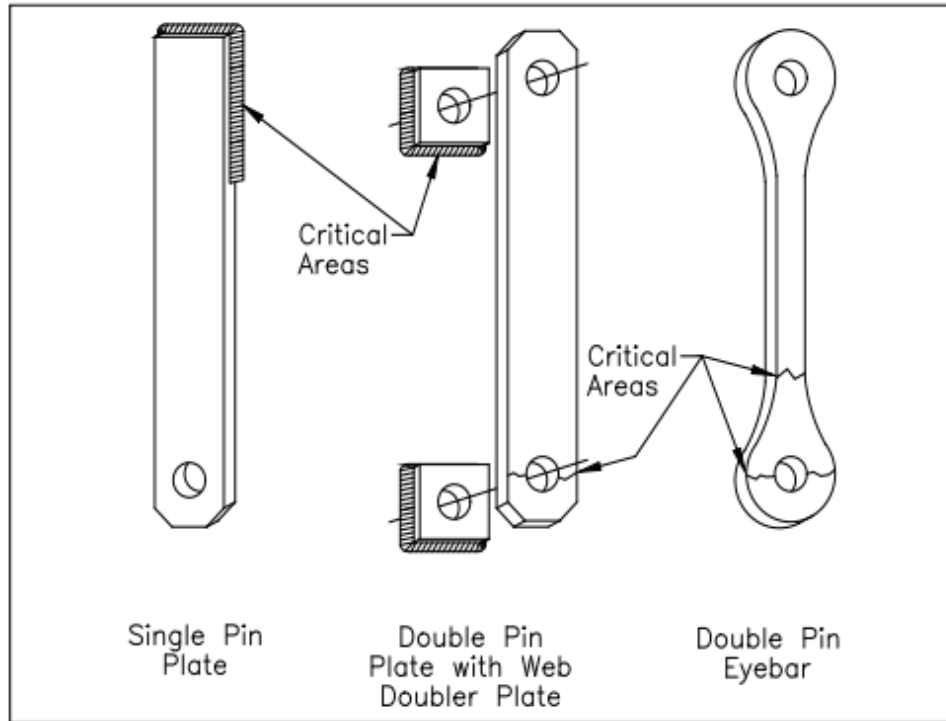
Fatigue Cracks in Pin and Hanger Assemblies
